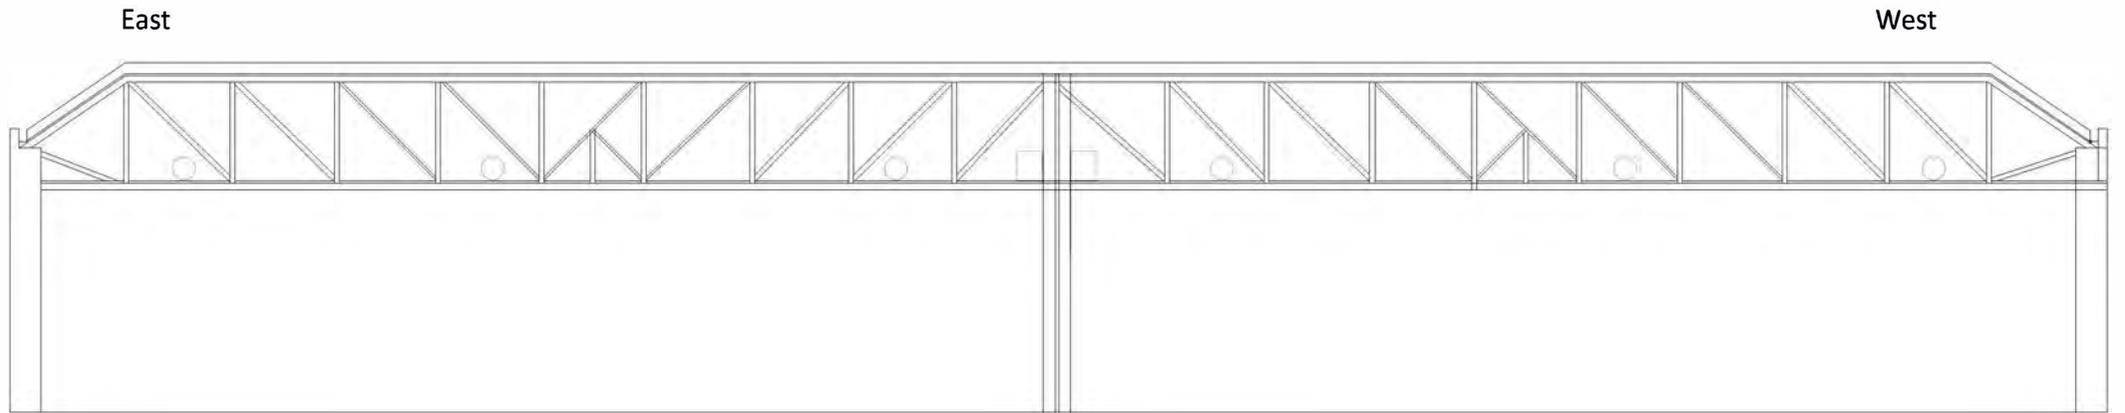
Schematic Lattice Girder Cross-Section (East-West) Buildings 354/361/377 and Ducting Buildings 361/377
